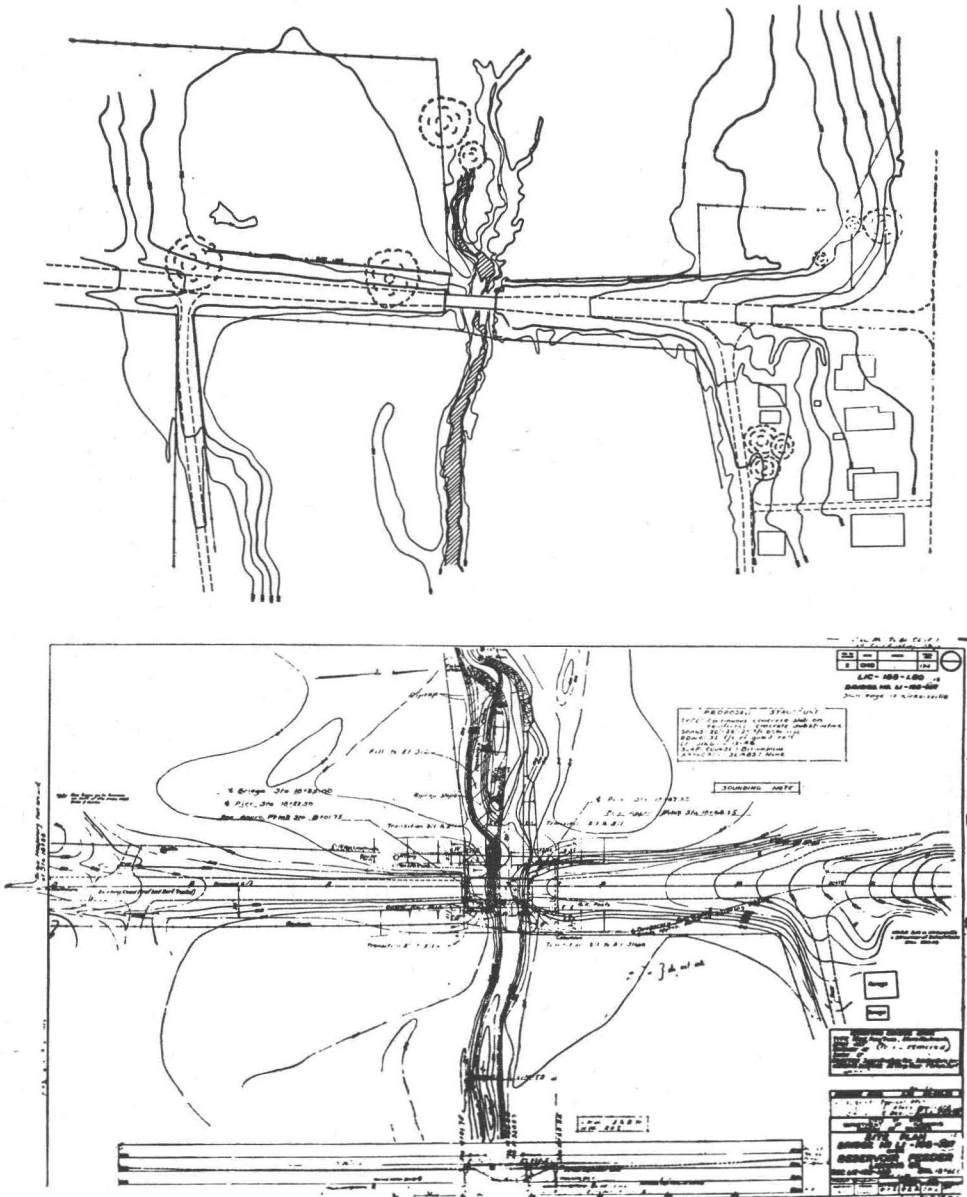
Top:* Bridge. Site plan with 2 foot contour intervals prepared by Kelsh Plotter. *Bottom:* Bridge site plan with 1 foot contour intervals developed from ground survey.
